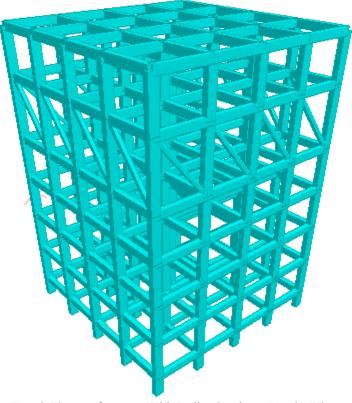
10 Second Floor Soft Storey With Inclined Column RenderView
